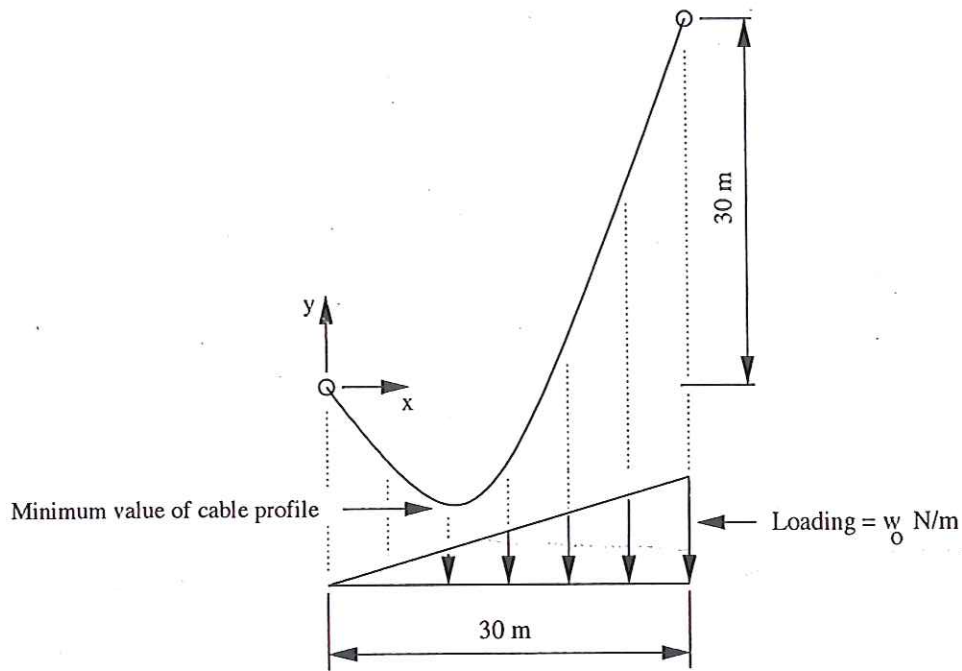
Elevation view of a swing bridge carrying a triangular loading.
